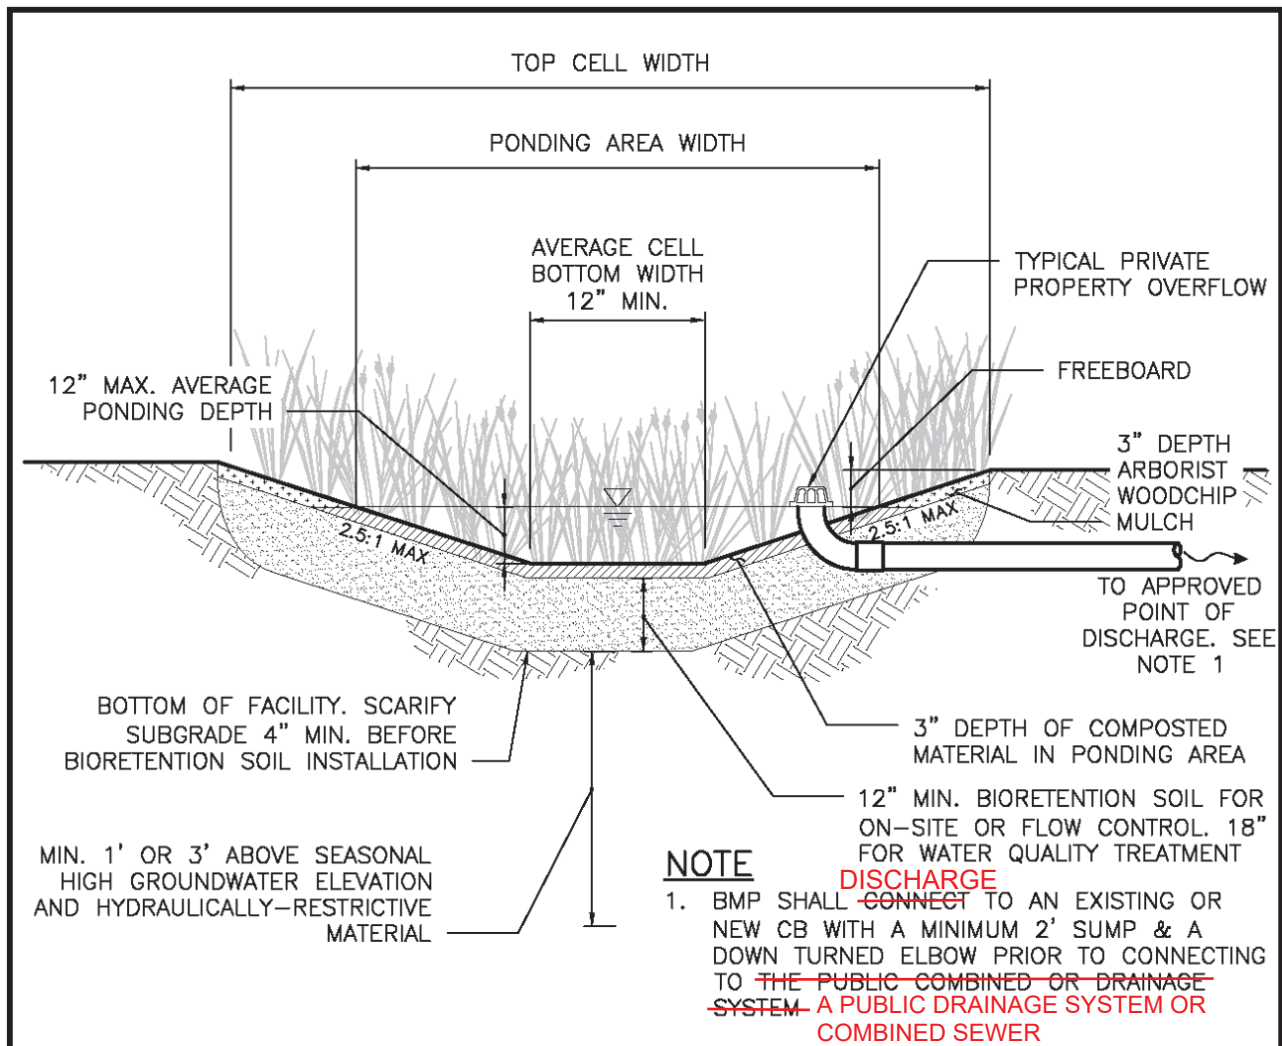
Infiltrating Bioretention Facility with Sloped Sides (without Underdrain).
